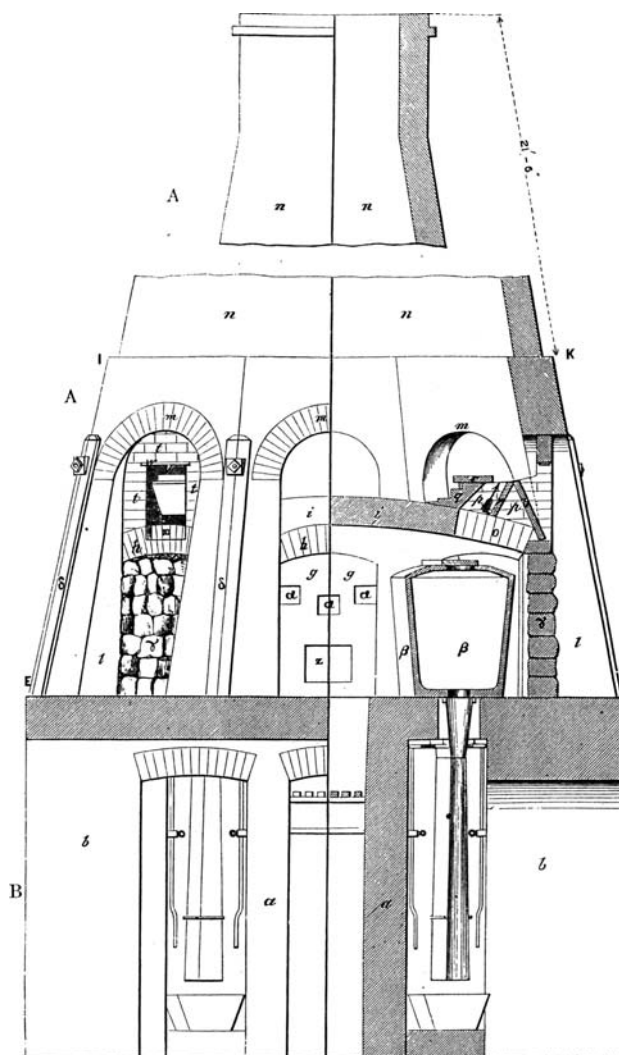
Section drawing of a zinc smelting furnace of the type introduced by Wm. Champion. From [20]
